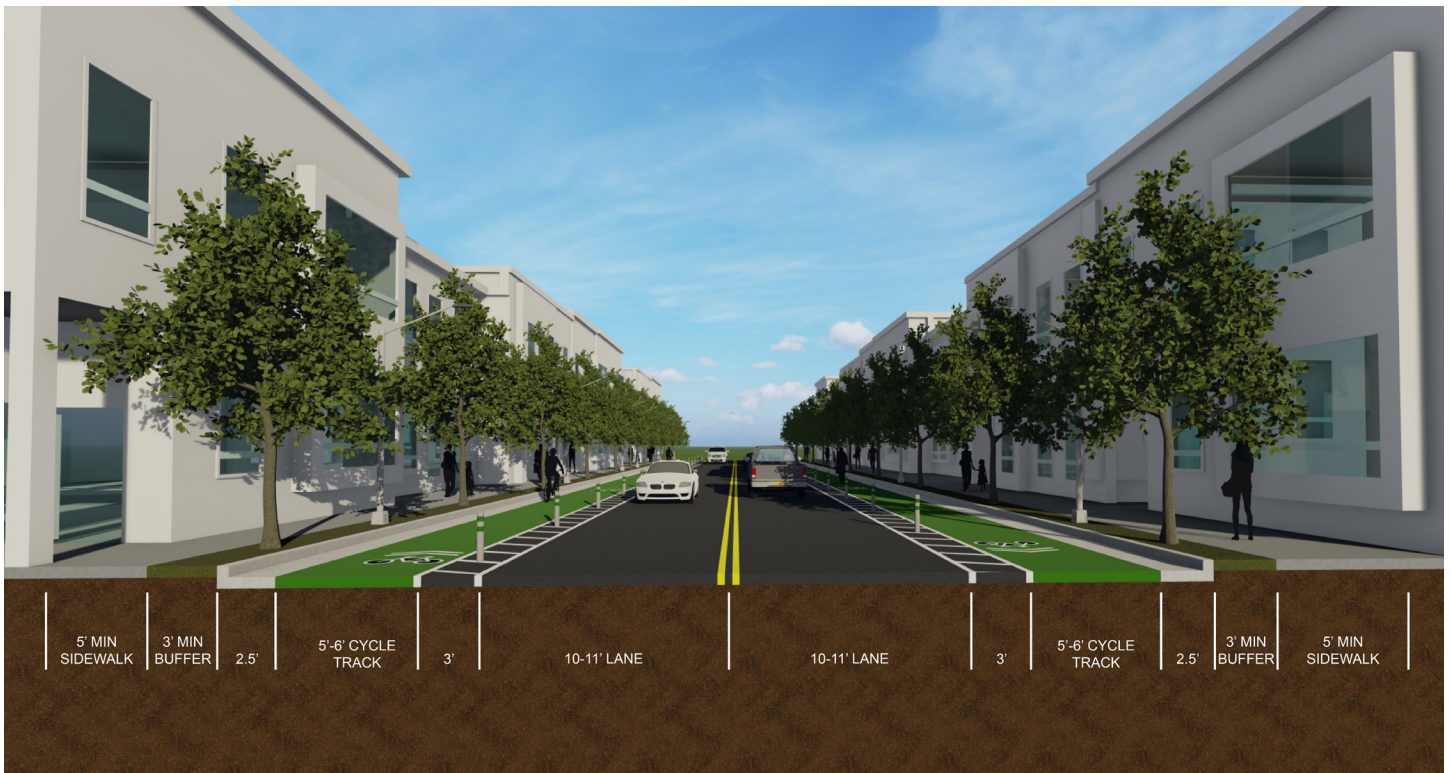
ON-STREET BIKEWAY SECTION
